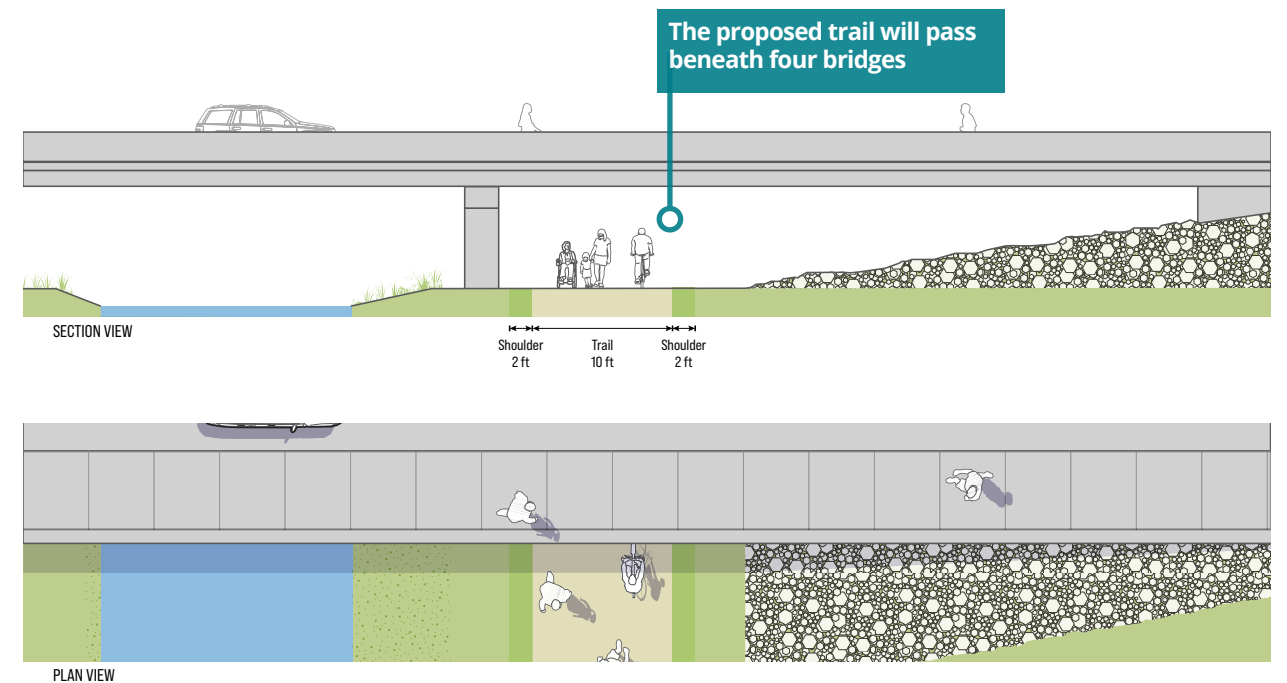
Illustrated Typical Section: Trail Beneath Bridge
